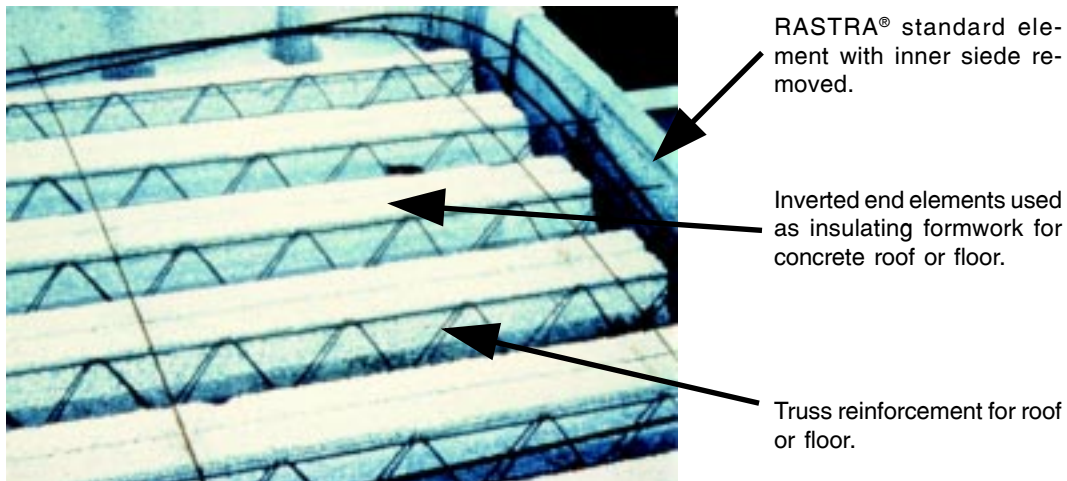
Illustration of Monolithic Pour for Walls and Floor or Roof.
